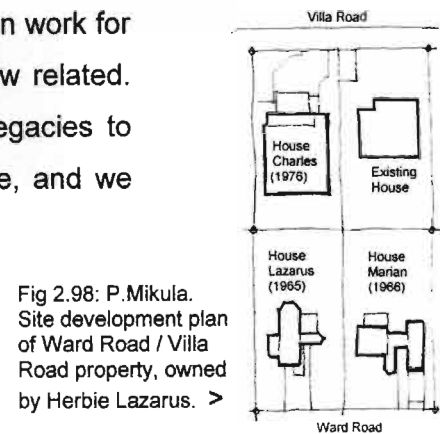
P.Mikula. Site development plan of Ward Road / Villa Road property, owned by Herbie Lazarus. >
